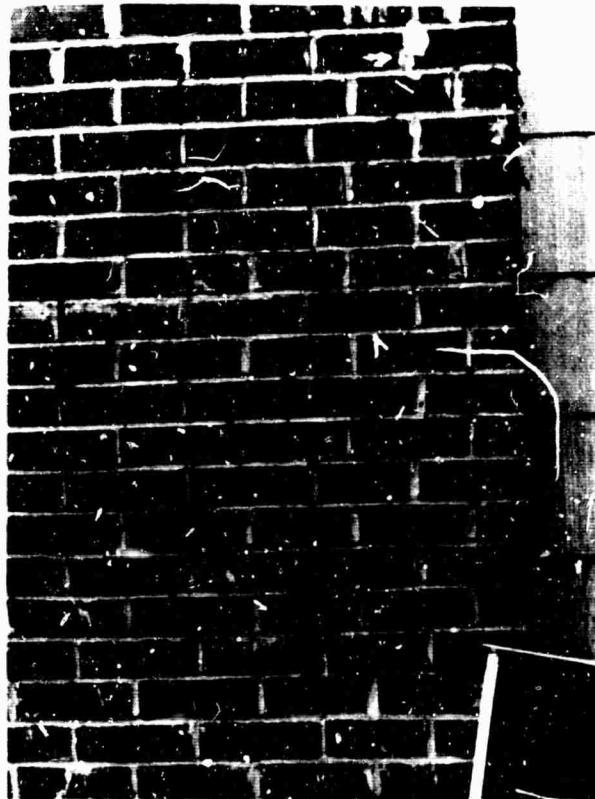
Postshot Cracks in H&N No. 228 - Chimney
